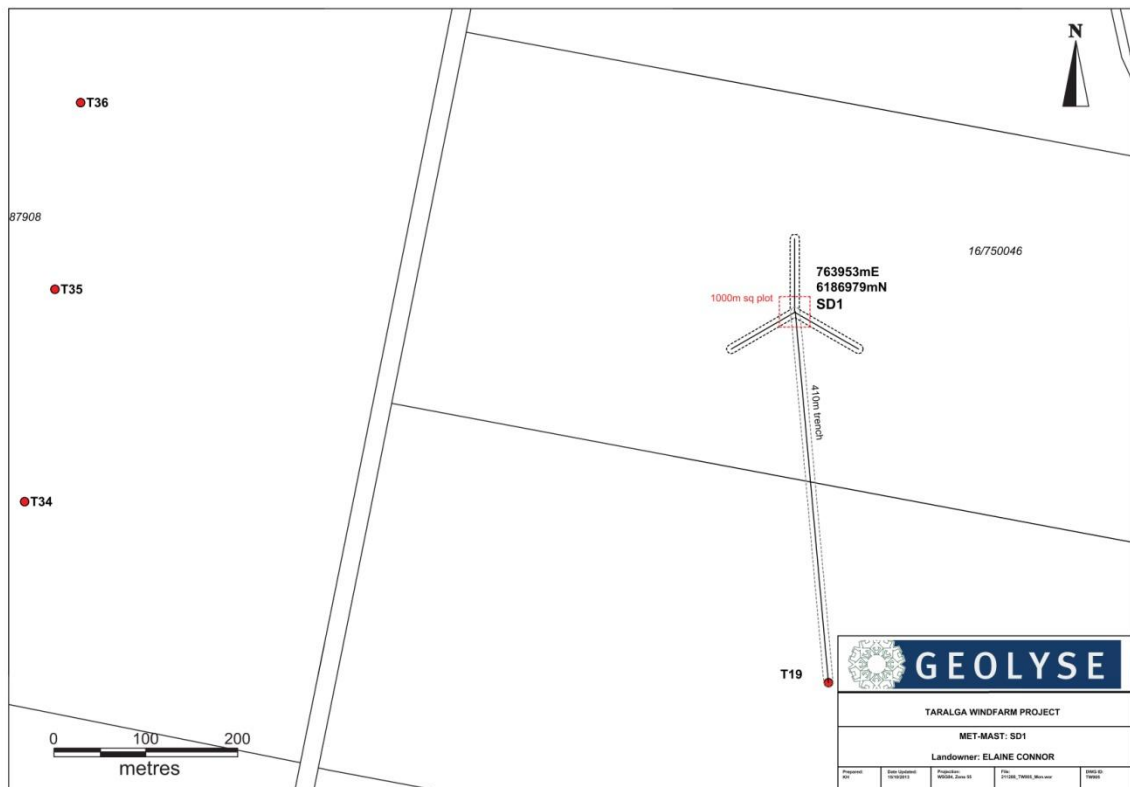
Plan of the proposed works at met-mast #SD1 and proposed trench to Turbine 19.
